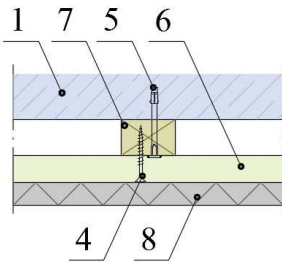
Fastening of a mounting lath onto a load-bearing lath
